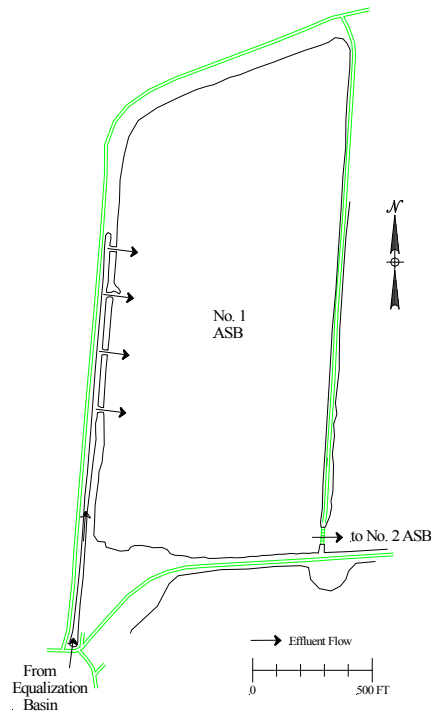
Scale Drawing of the Mill T No. 1 ASB
